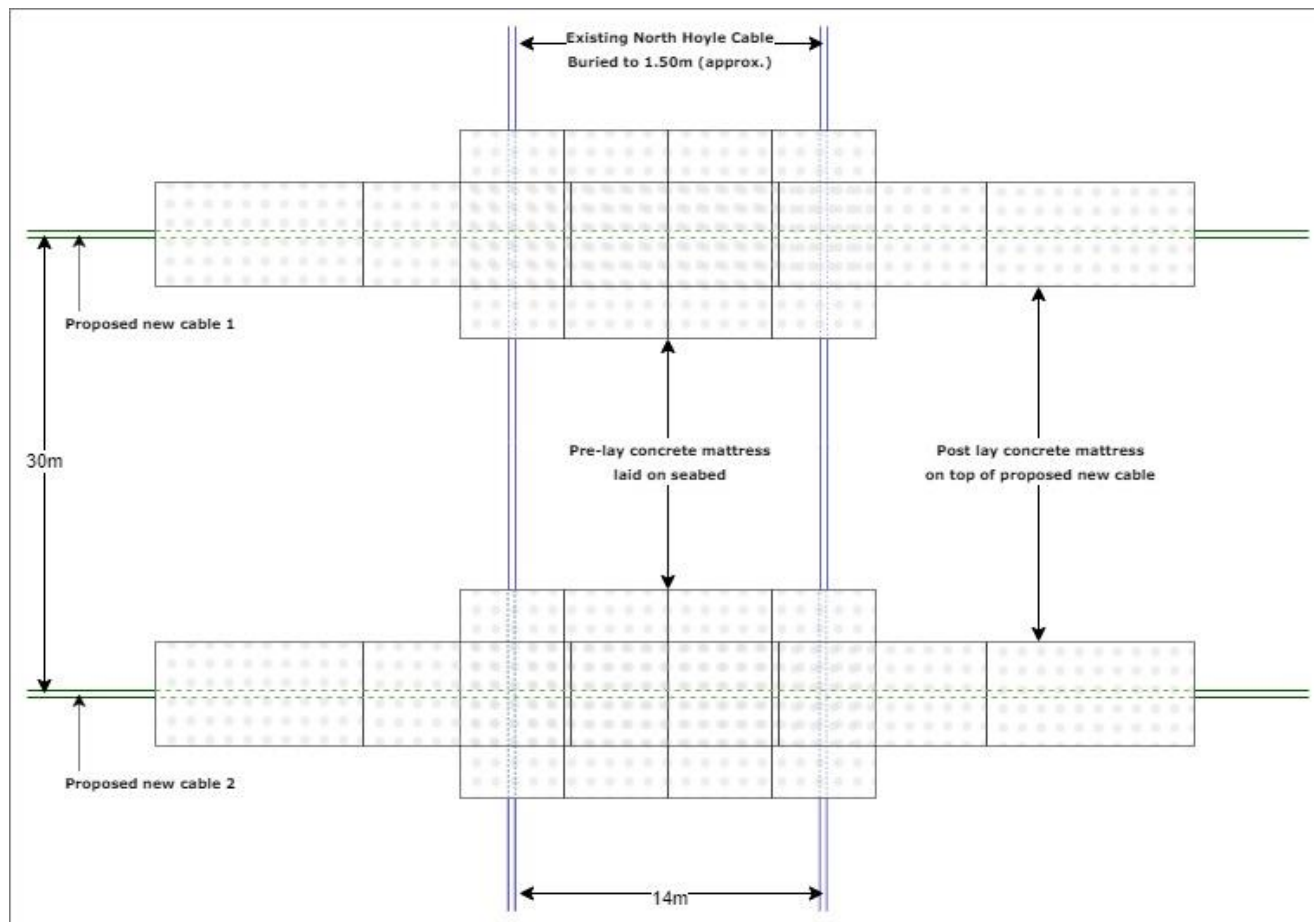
Final Crossing Design Schematic for North Hoyle Cable Crossing
